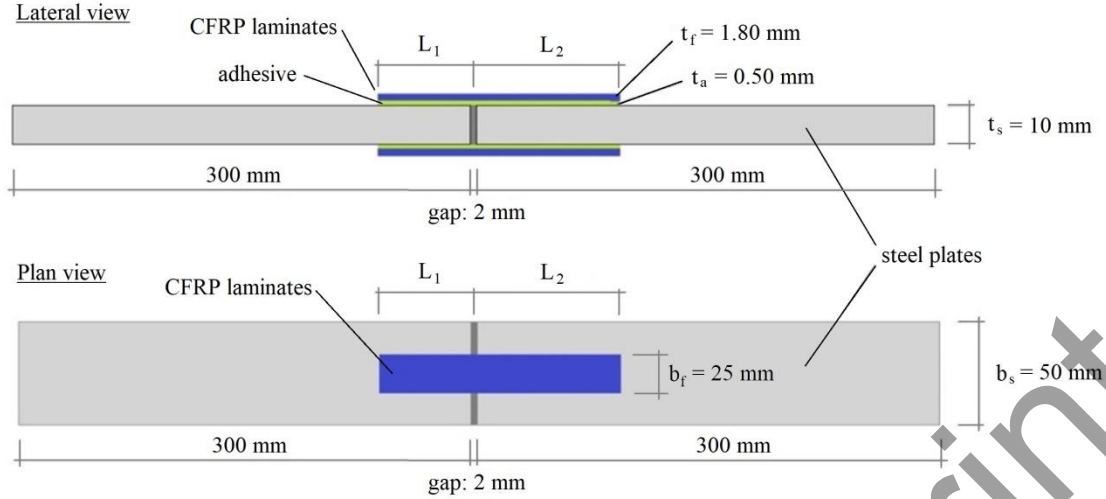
Schematic view of the CFRP-steel double-strap joint specimens (dimensions are not to scale).
